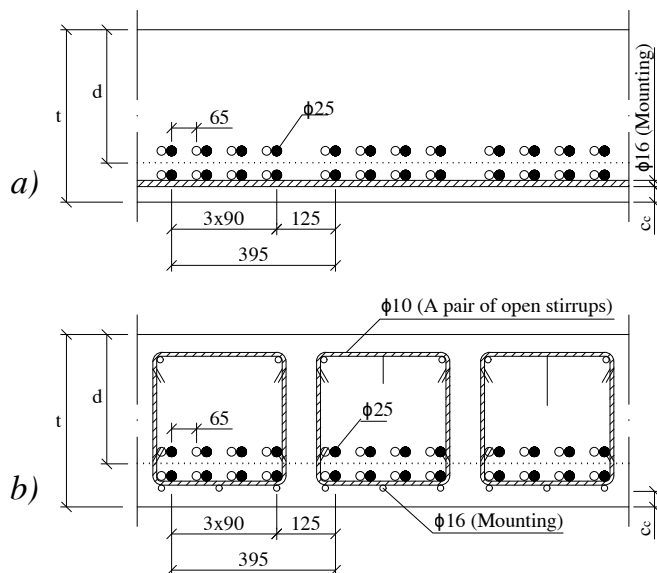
Reinforcement layout used in the preliminary design. a) In sections without shear reinforcement. b) In sections with shear reinforcement.
